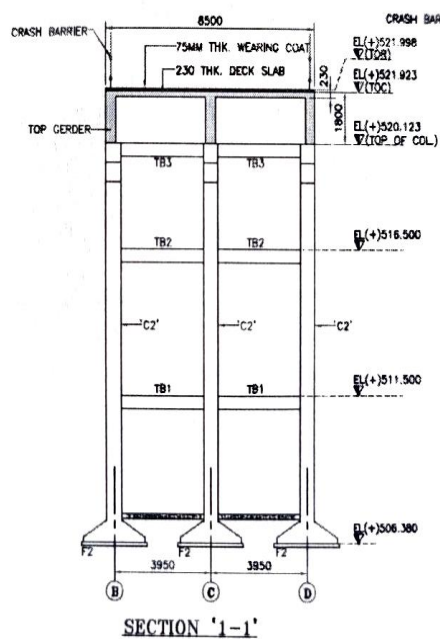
General Arrangement Drawing (GAD) of the study bridge
